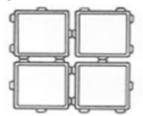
Permeable Pavement - for turf growth: Installed with larger joints - spacer on spacer - filled with a soil-gravel mix
